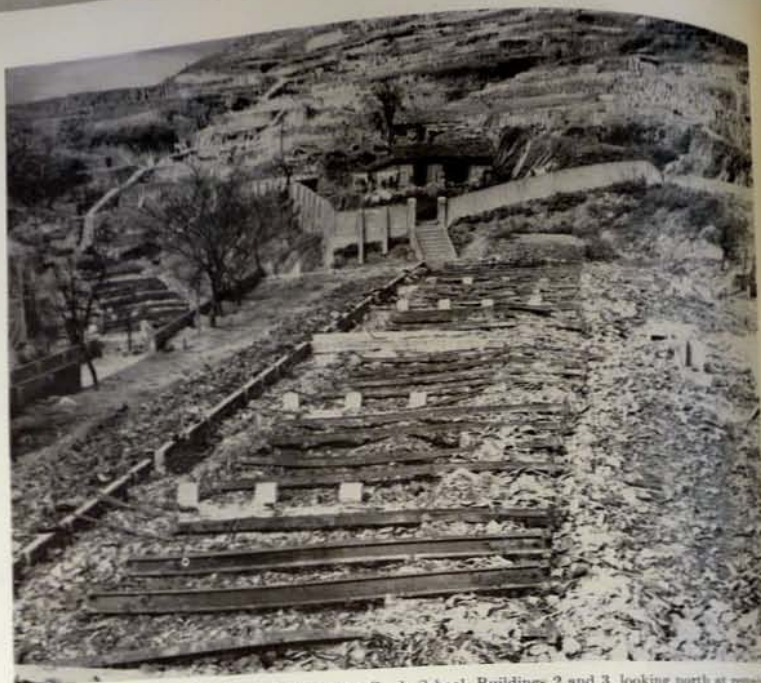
6,800 feet from GZ. Group 42, Nishizaka Grade School, Buildings 2 and 3, looking north at remains and steel framing.
